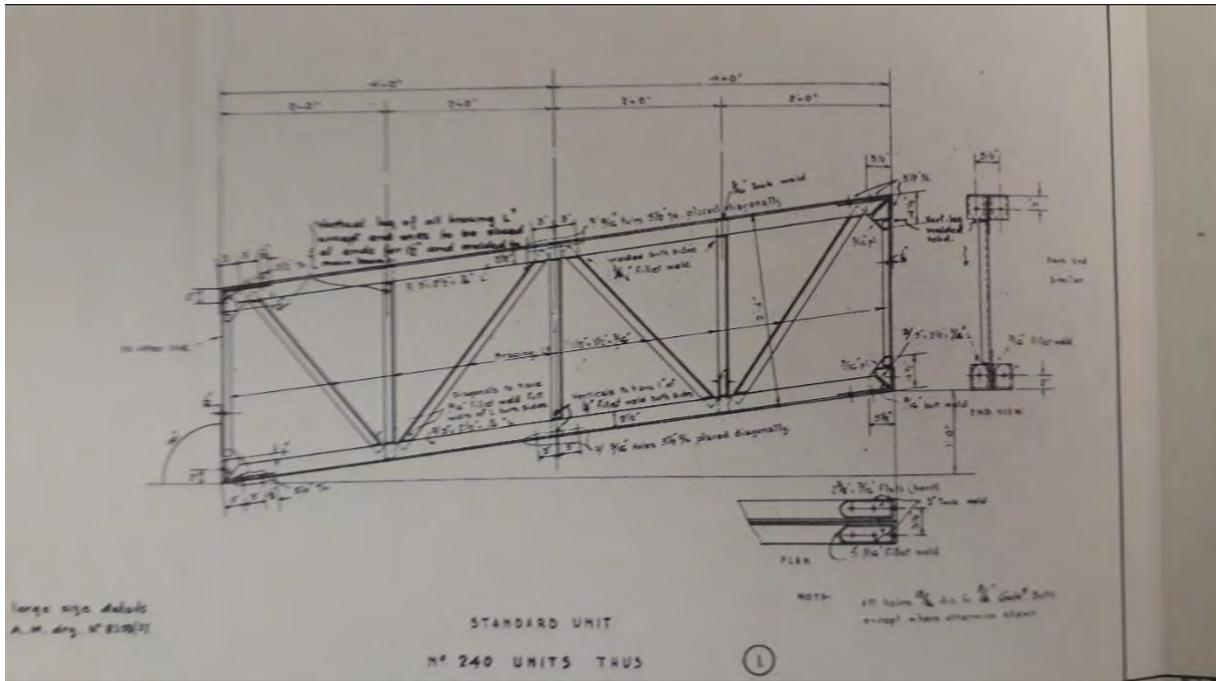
Plate YY. Detail of a standard section (Work 44/37 and work 44/38)
